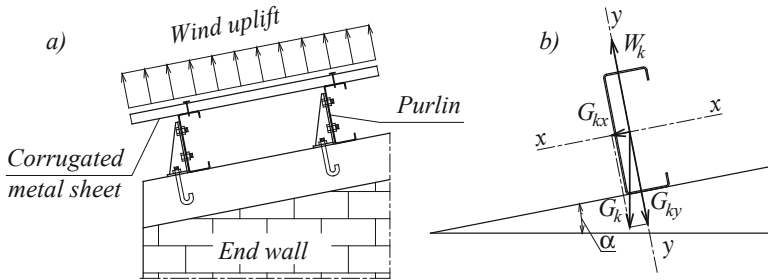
The connection between metal sheet – purlin – end wall; load on purlin
